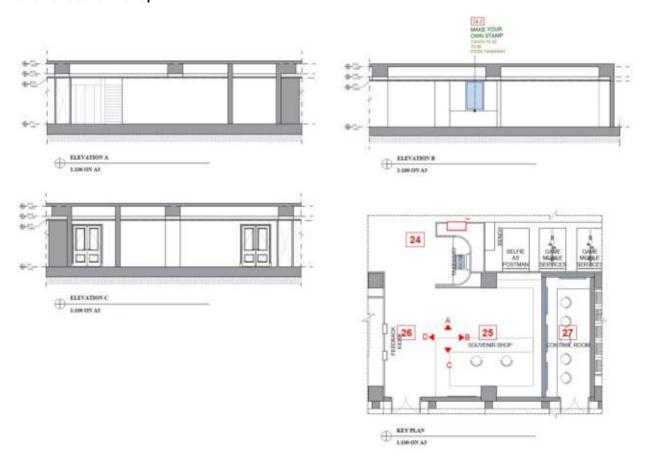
Proposed zone 25 Elevations. (Source-Author)
